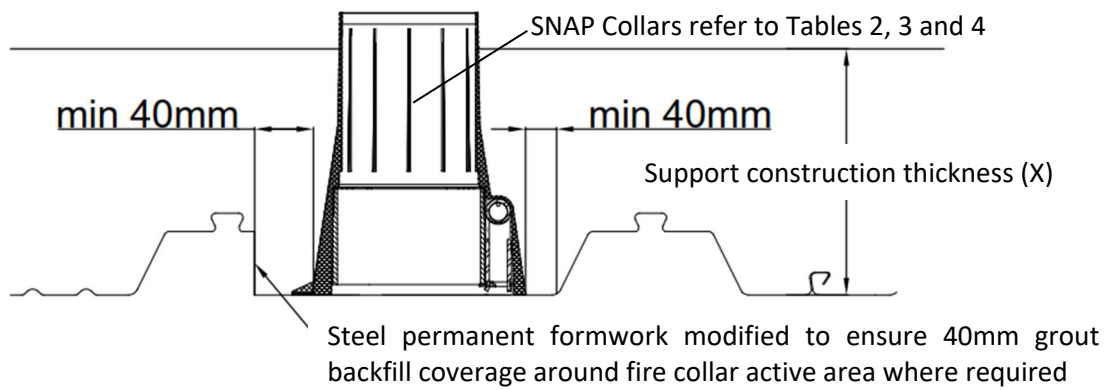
An example of the installation of SNAP collars in concrete with steel permanent formwork slab – active area of the collar $\geq 40\text{mm}$ from edge of rib
